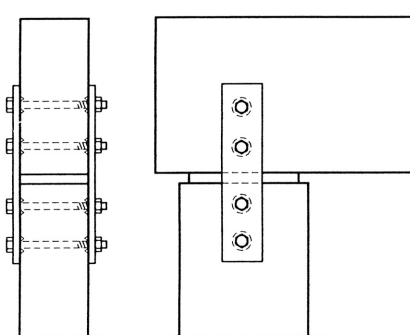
Joint with steel bars with bolts or screws and with or without connectors. The bearing plate (e.g. of plywood) between the column and the beam centres the load and prevents overloading of the corner of the column.
